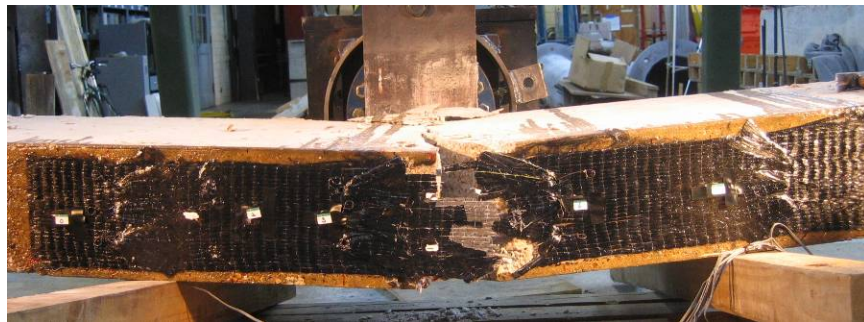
Failure of A-BF-A-2S, fracture of CFRP sheet
